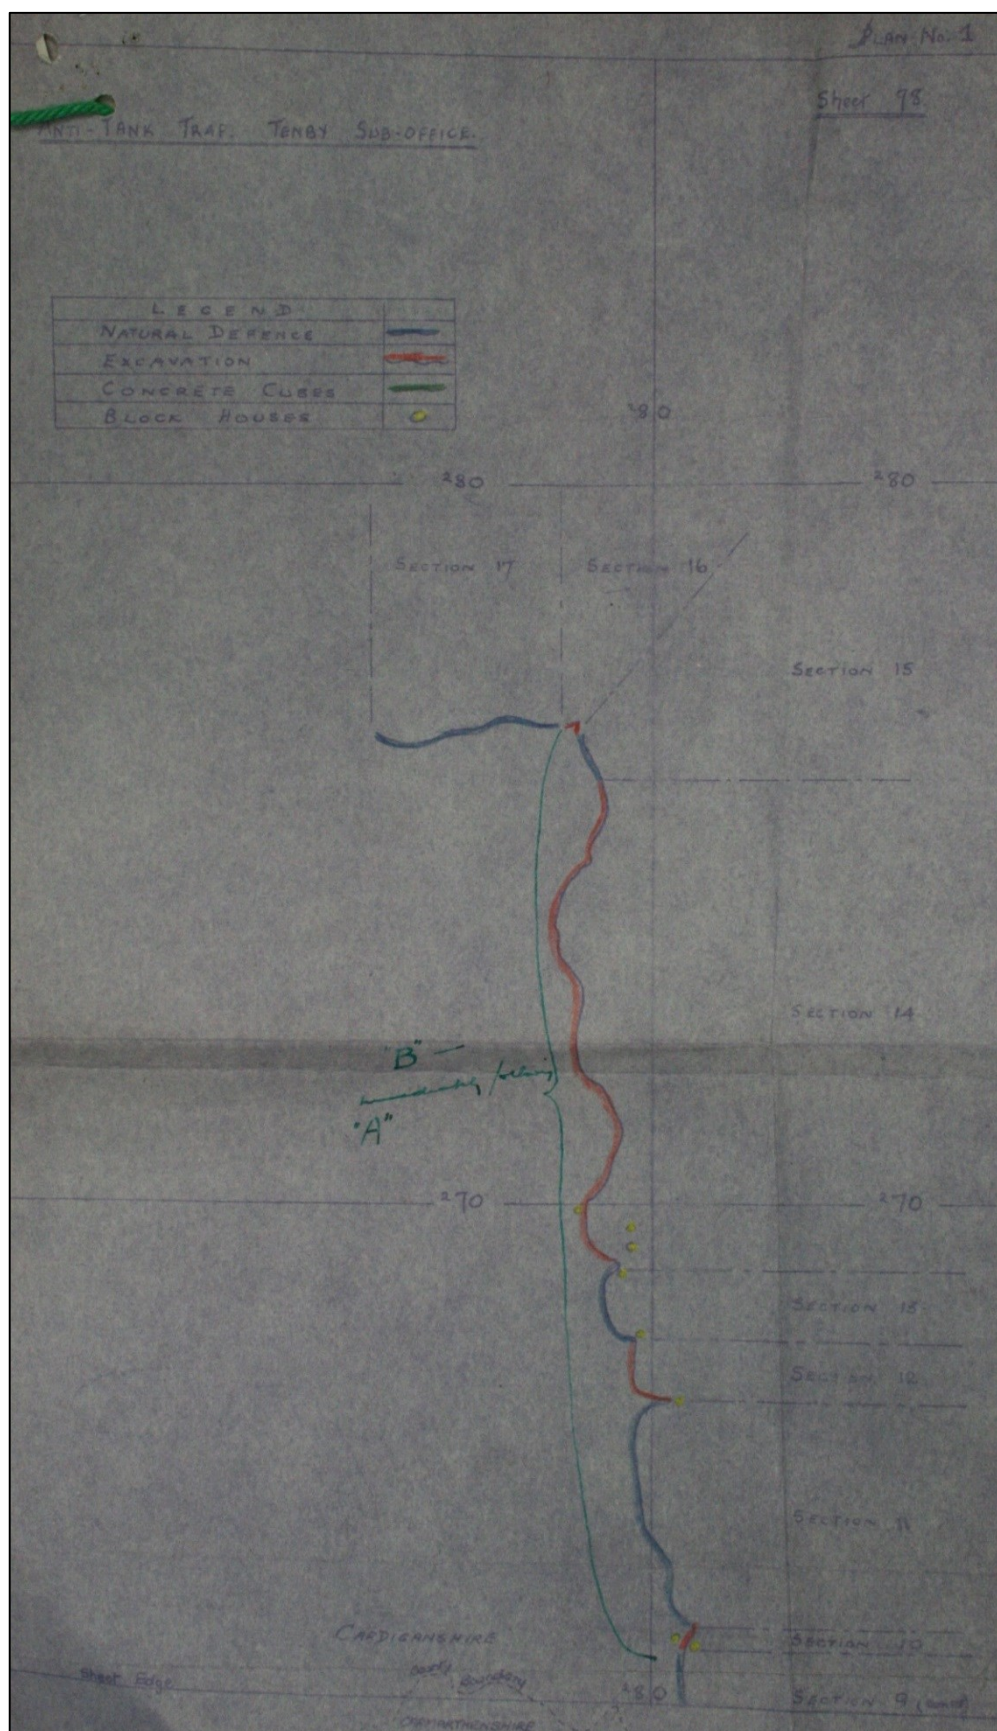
Plan depicting natural defences, excavation, concrete cubes and block houses for northern (Llangrannog Aber-banc) section of Carmarthen Stop Line (TNA MAF 112/204).
